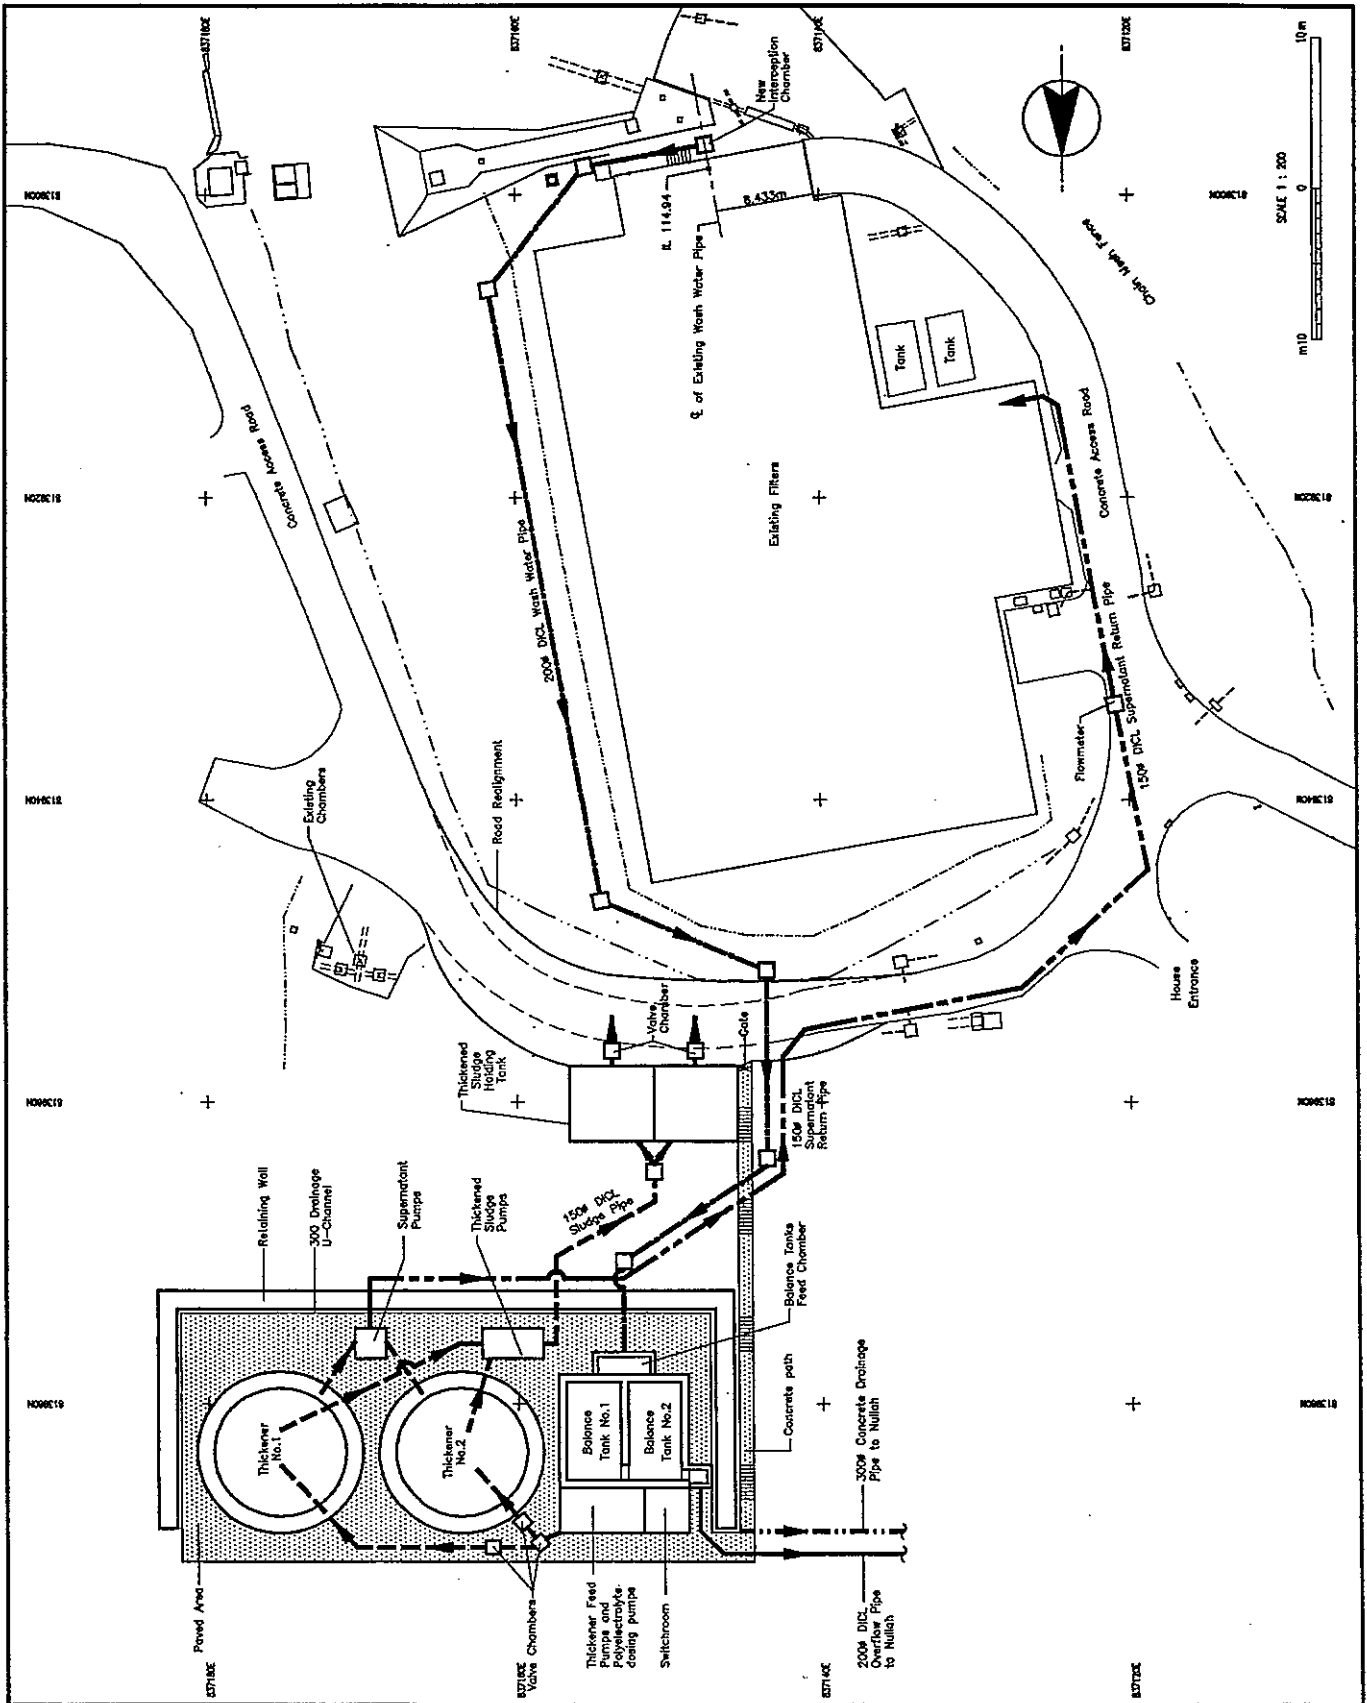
Layout of Proposed Sludge Treatment Facilities at Eastern WTW
